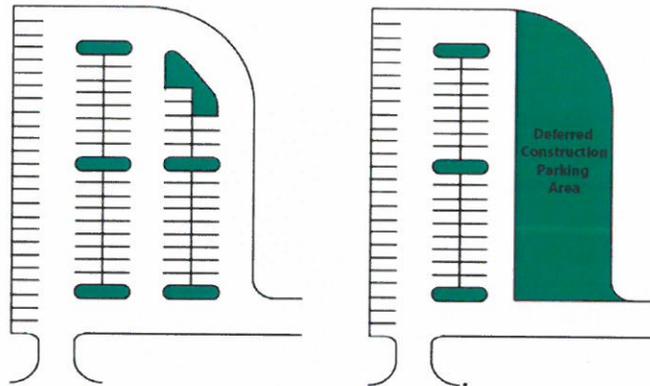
B A: The parking lot shown on the left is a traditional parking lot with interior parking islands while the parking lot on the right illustrates where an area is unimproved but is designated for future parking spaces if the demand arises.
